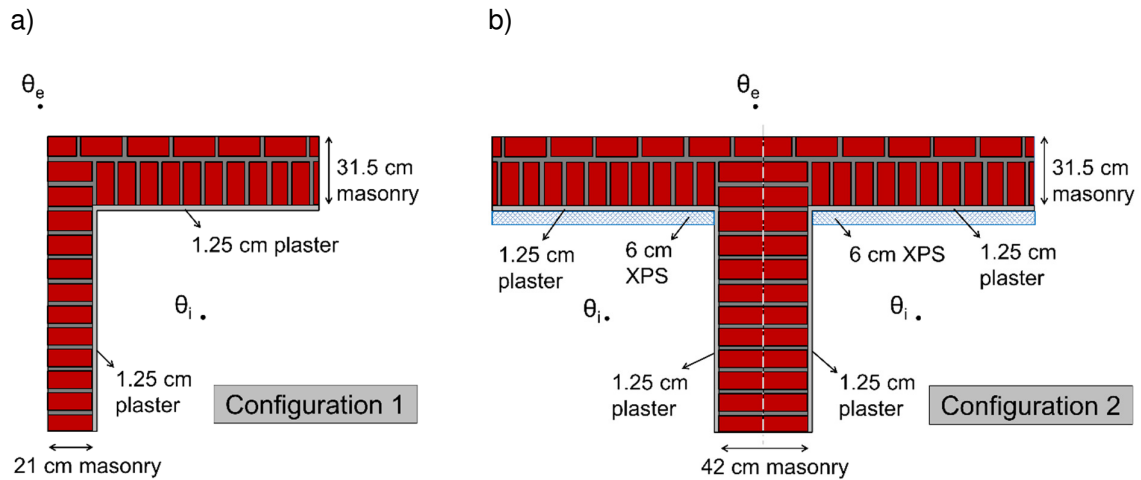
Test configurations: (a) exterior non-insulated wall, (b) junction between insulated exterior wall and non-insulated interior wall.
